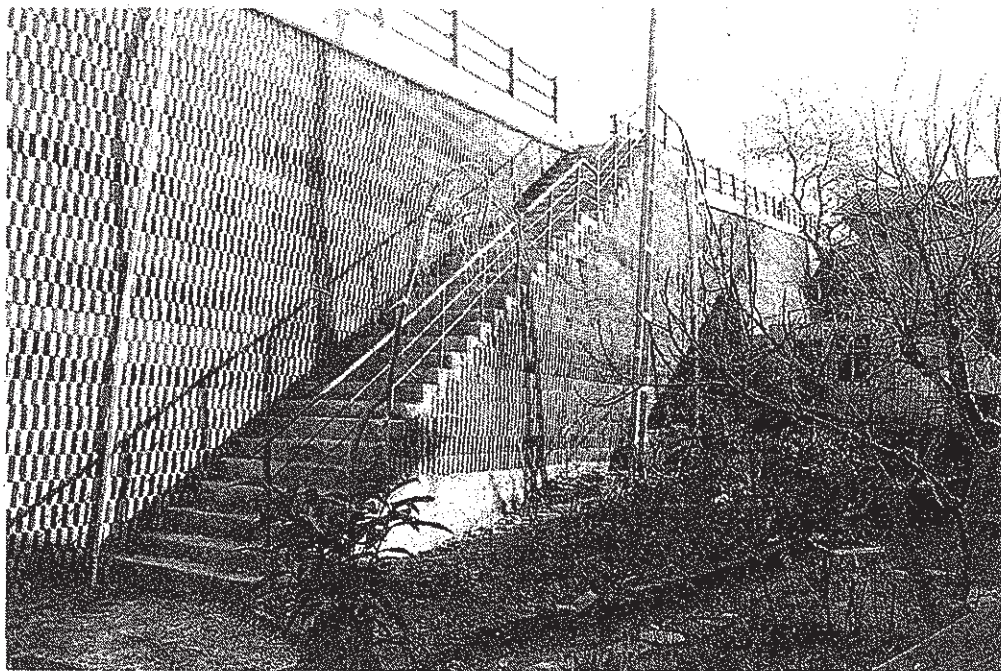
A detail of the ladder structure embedded into Geosynthetic Reinforced Segmental Retaining Structure
